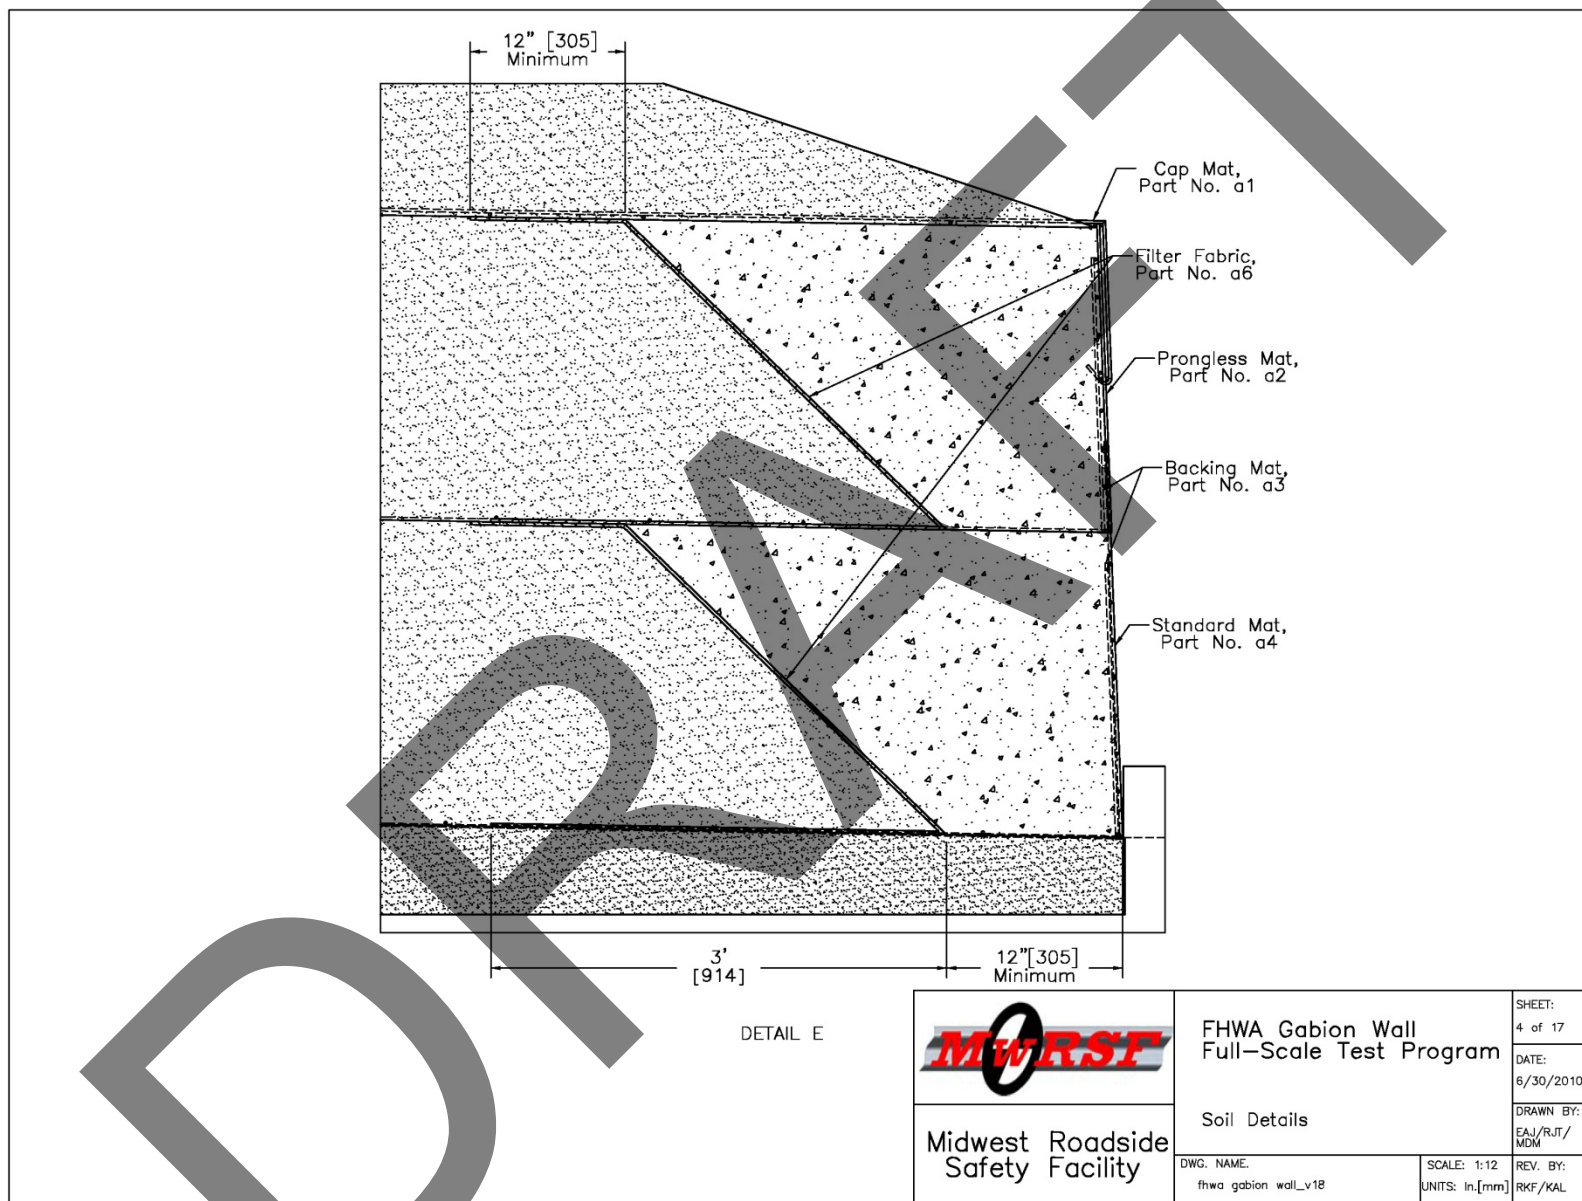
Schematic. Soil Details, Test Nos. MGSGW-1 and MGSGW-2.
